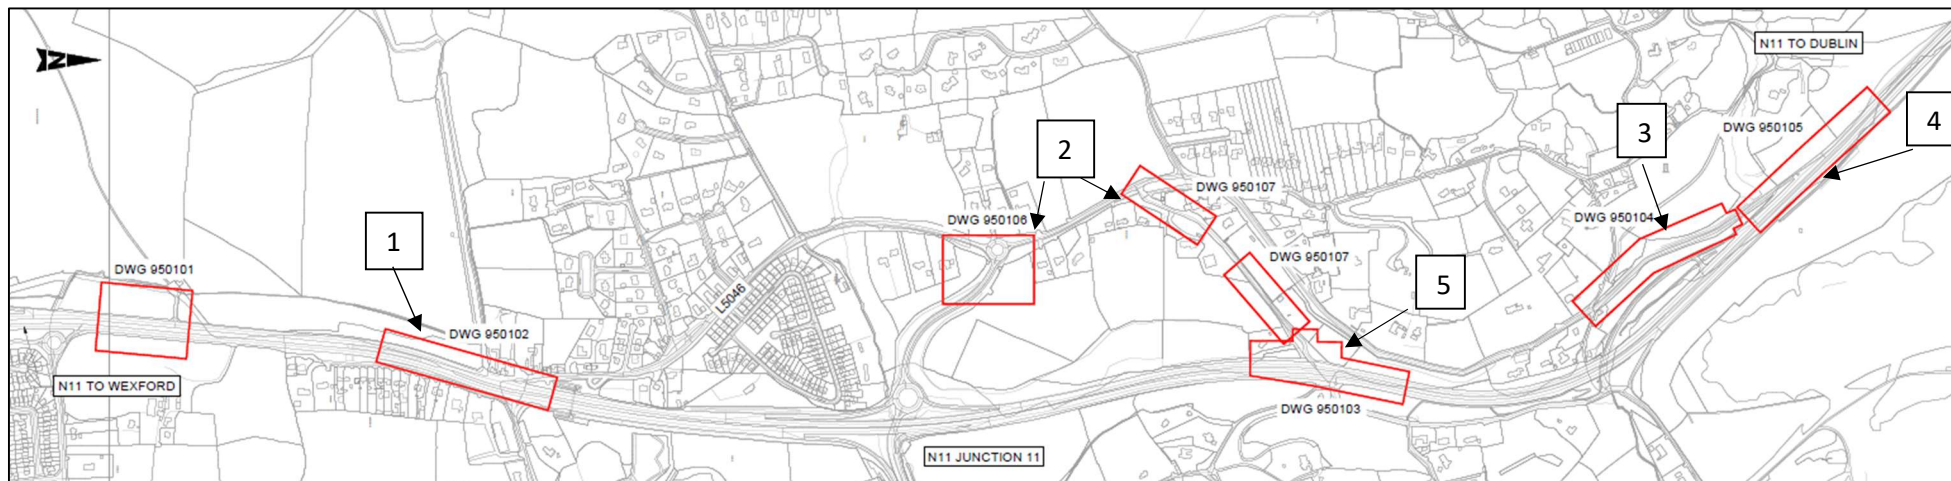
Proposed road safety measures to the N11 / L5046 (SITE MAP - HD15 SITES REVIEW - N11WW021.4&021.9)
